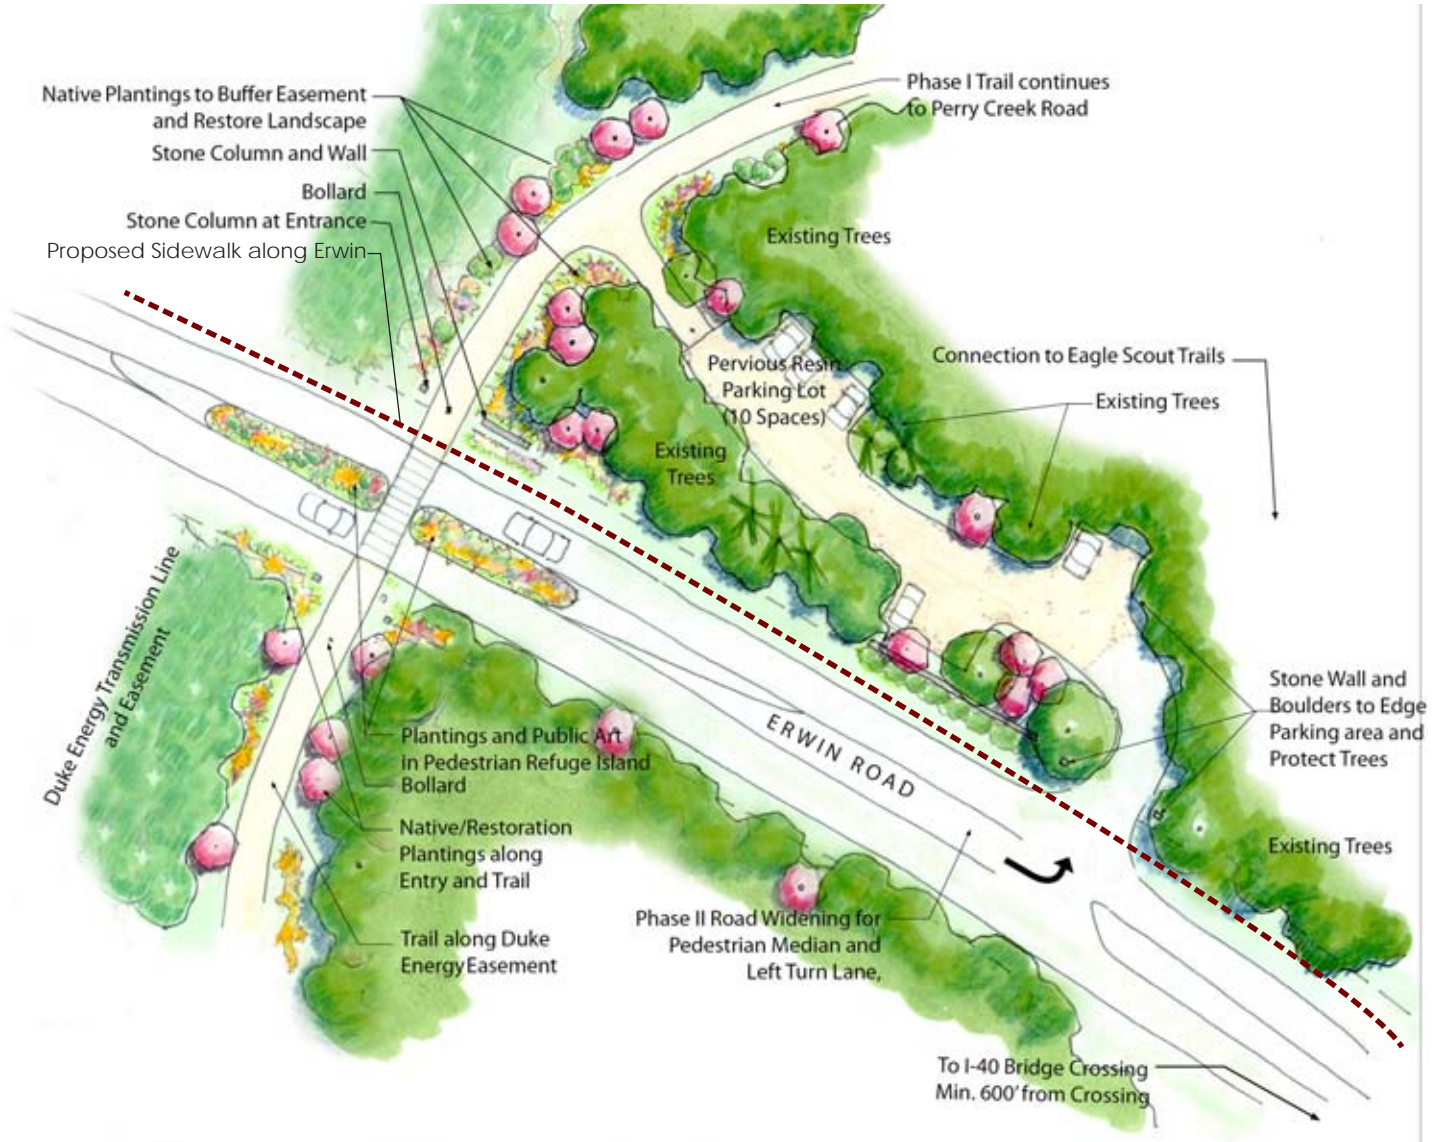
Parking Lot, Trailheads, and Pedestrian Crossing at Erwin Road
